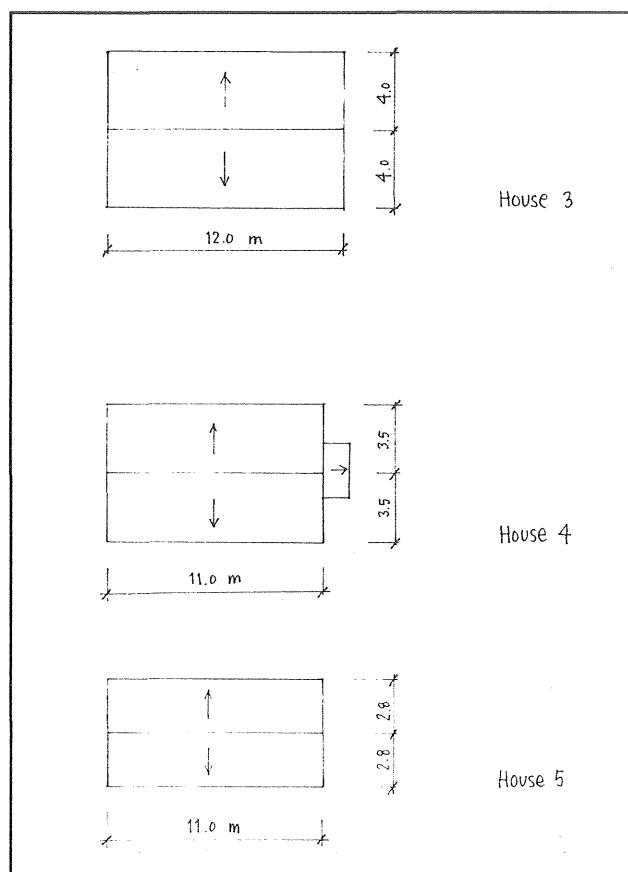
Horizontal roof area, houses 3, 4 and 5.
